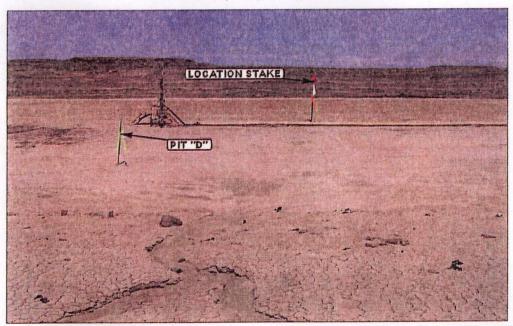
PHOTO: VIEW FROM PIT "D" TO LOCATION STAKE
